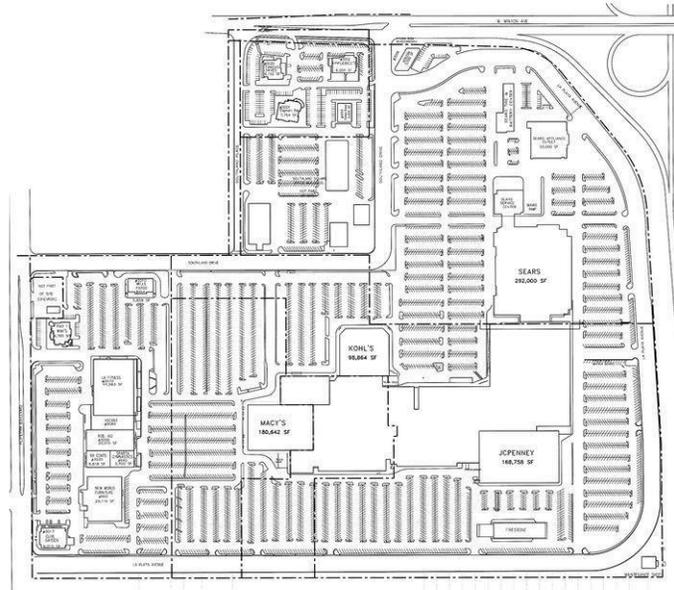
Southland Mall Site Plan. Source: Directory of Major Malls, retrieved 11/15/22, note that this site plan may not reflect current tenants or configuration.
